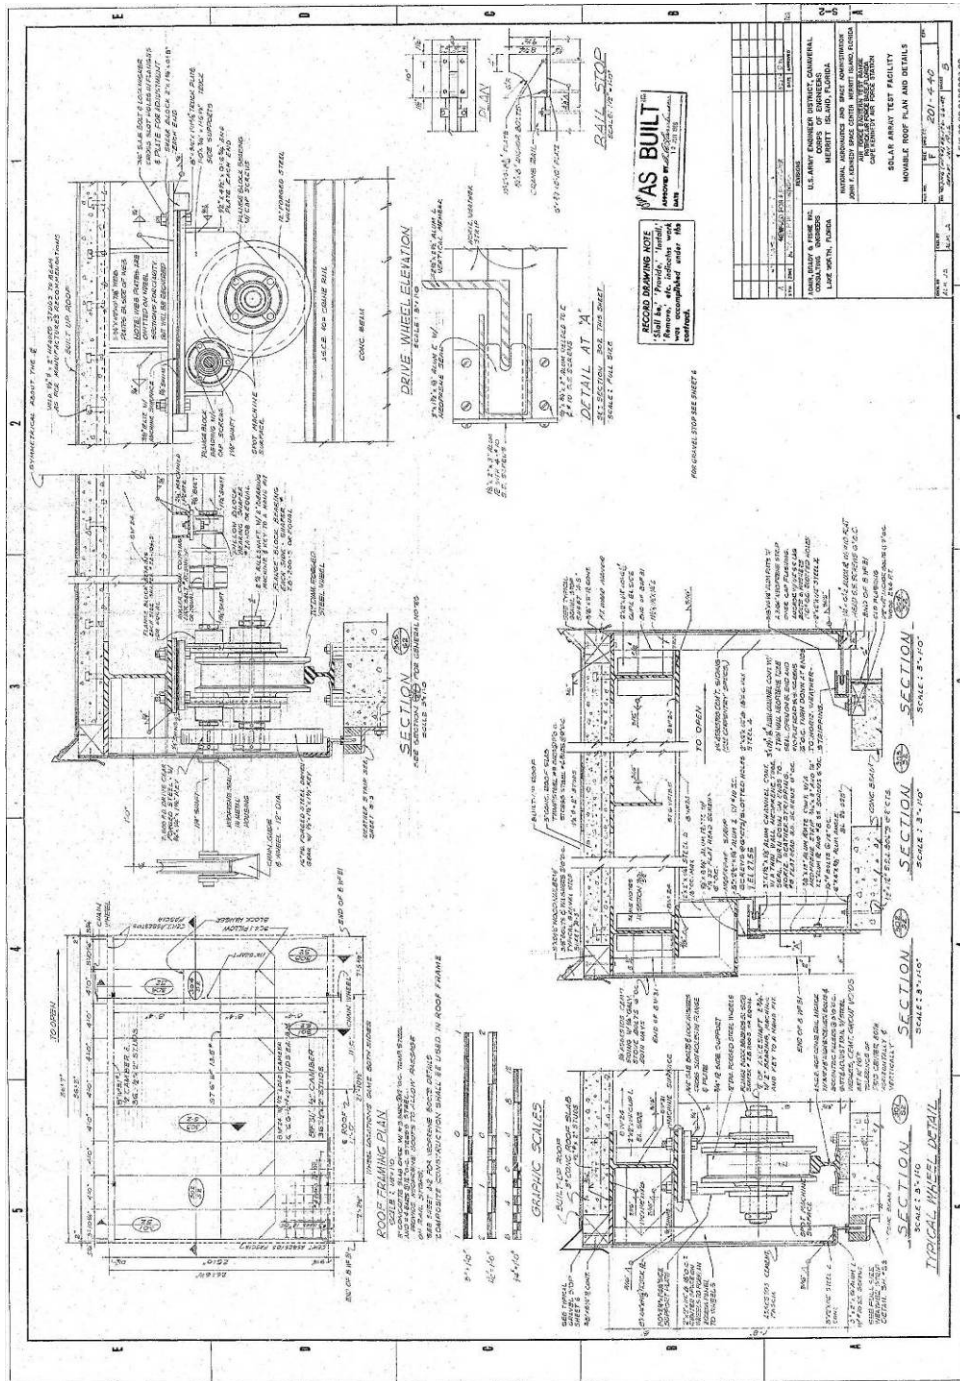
Adair, Brady & Fische, Inc., Solar Array Test Facility, Moveable Roof Plan and Details, January 1966, Sheet 8.
